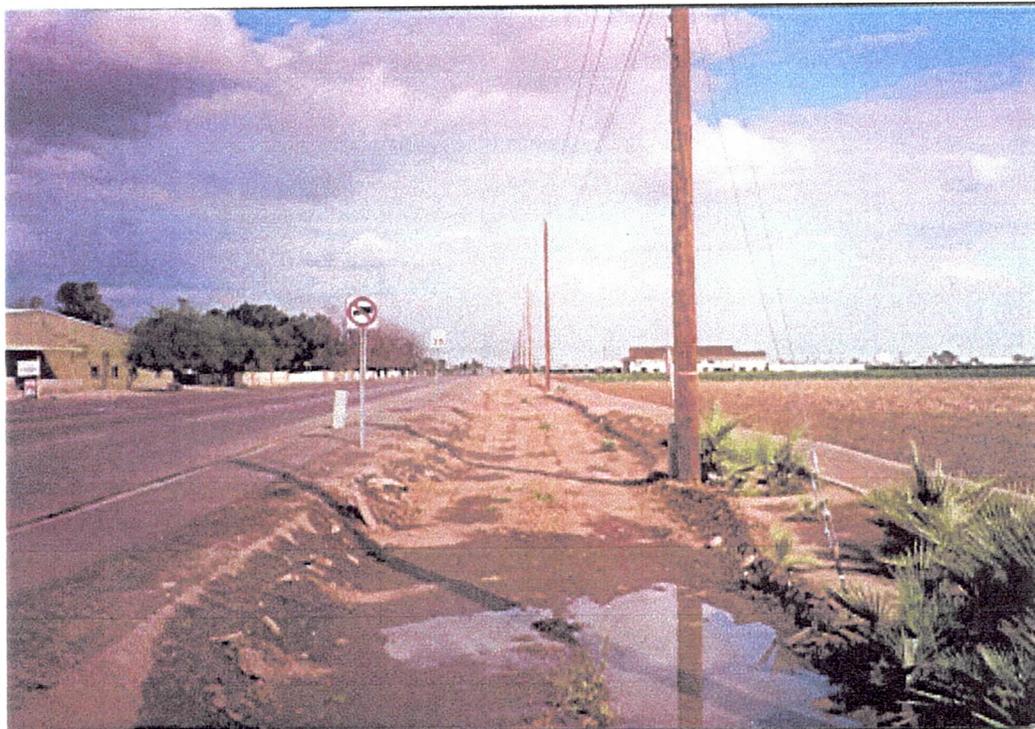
Local ponding at the southeast corner of 95th Avenue and Jackson Street (looking south).
